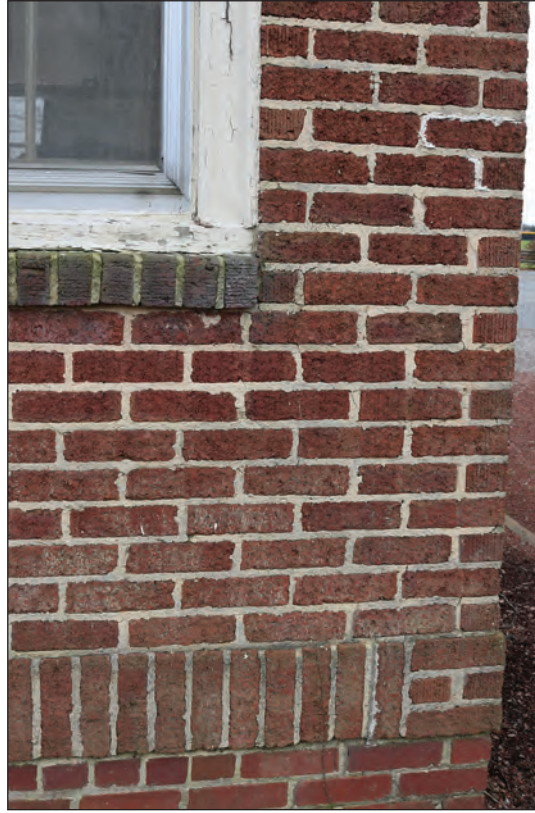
Raymond R. Knight Farm Dwelling, Material Detail
